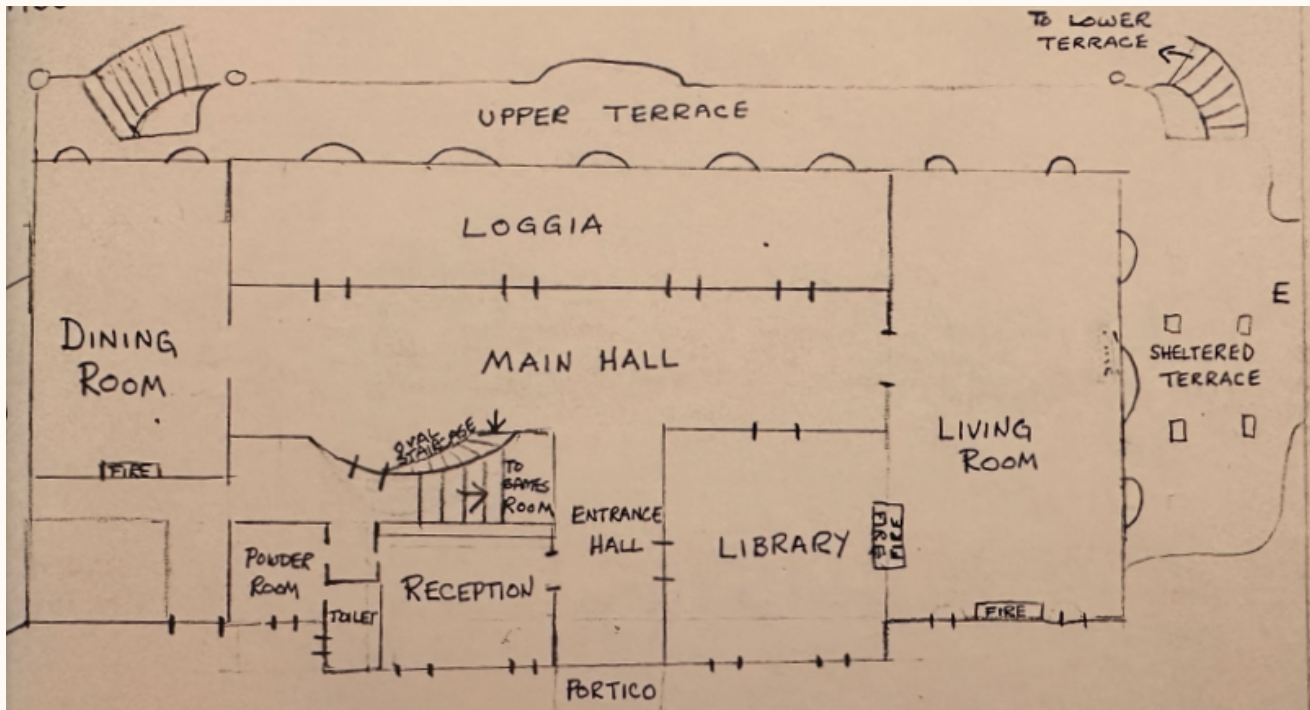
Floor plan roughly showing how the ground floor would have looked c. 1930. (Glendon Hall 1920-1950)
